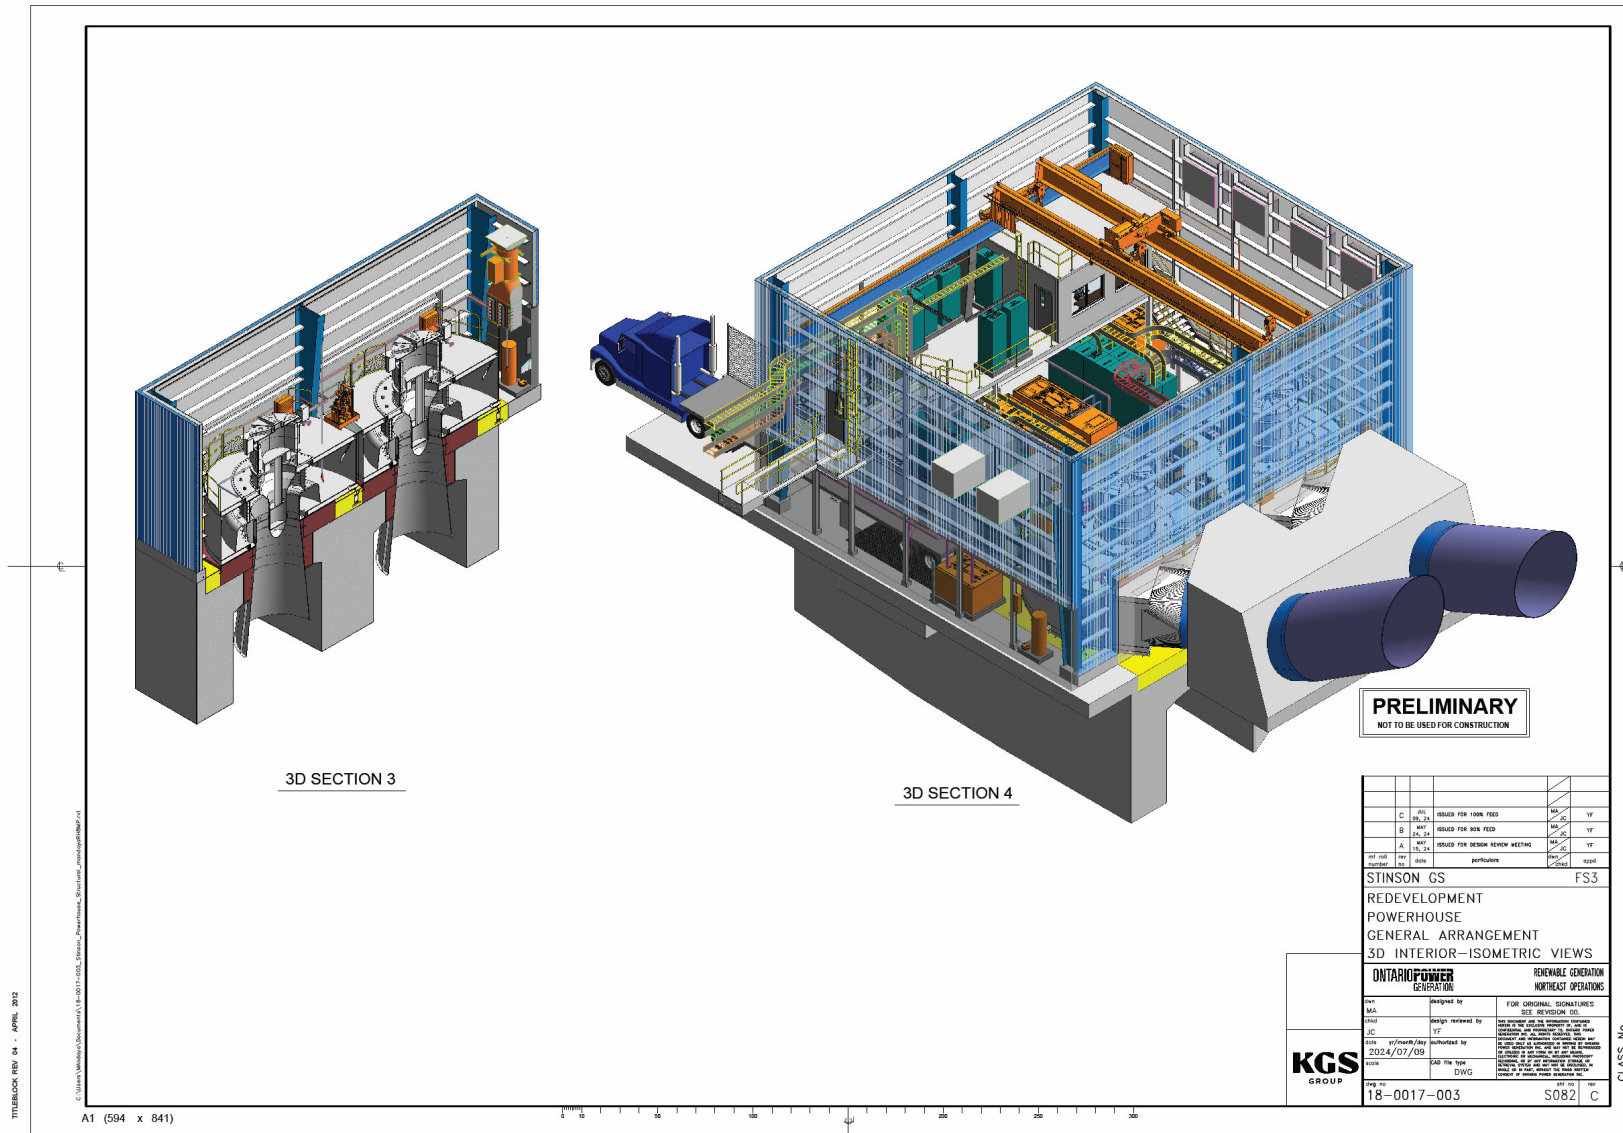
Powerhouse General Arrangement Interior 3D View
